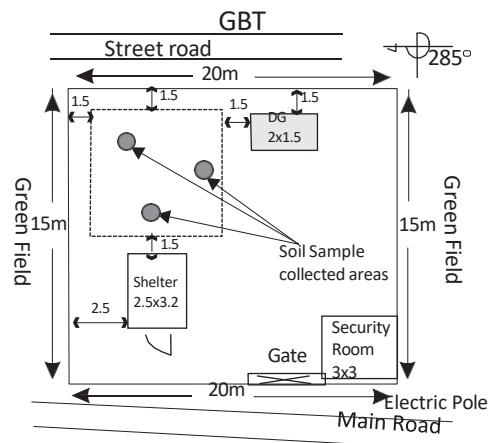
Design Layout of a Ground Based Tower Site (GBT)
